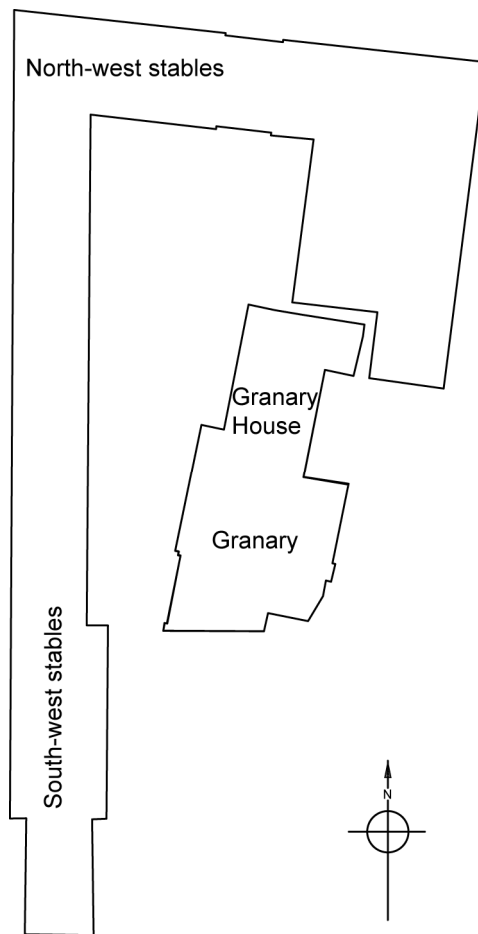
Plan showing the layout of the outbuildings immediately to the north-east of Apethorpe Hall
